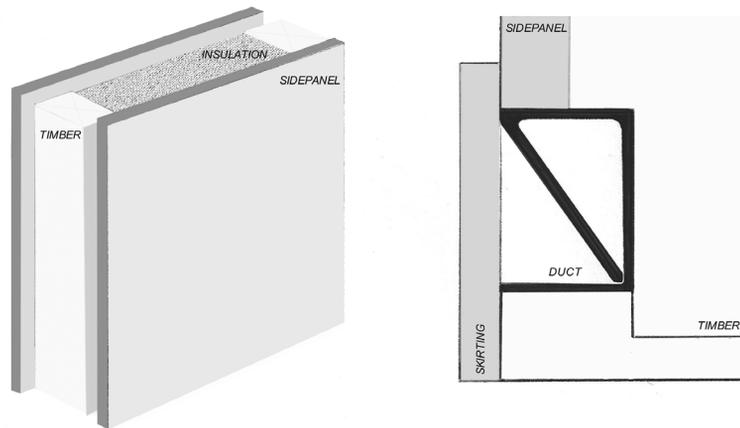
Basic partition wall configuration (left) and detail of the cable-duct behind skirting board (right) [Source: Bob Geldermans].
